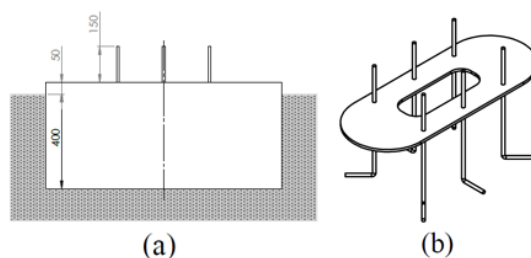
(a) Foundation and (b) enclosure fixing system.
